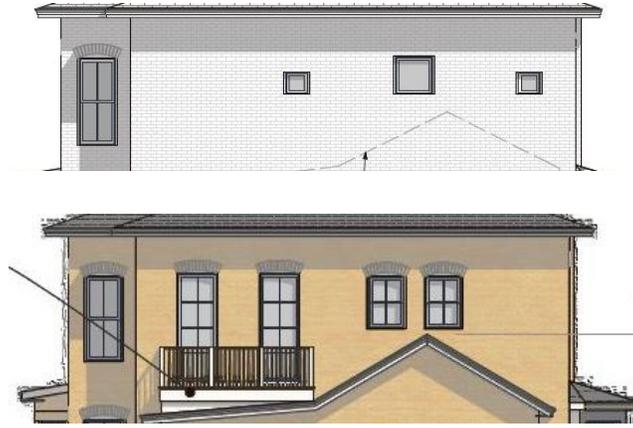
Existing and proposed changes to the fenestration at the south (rear) elevation.
